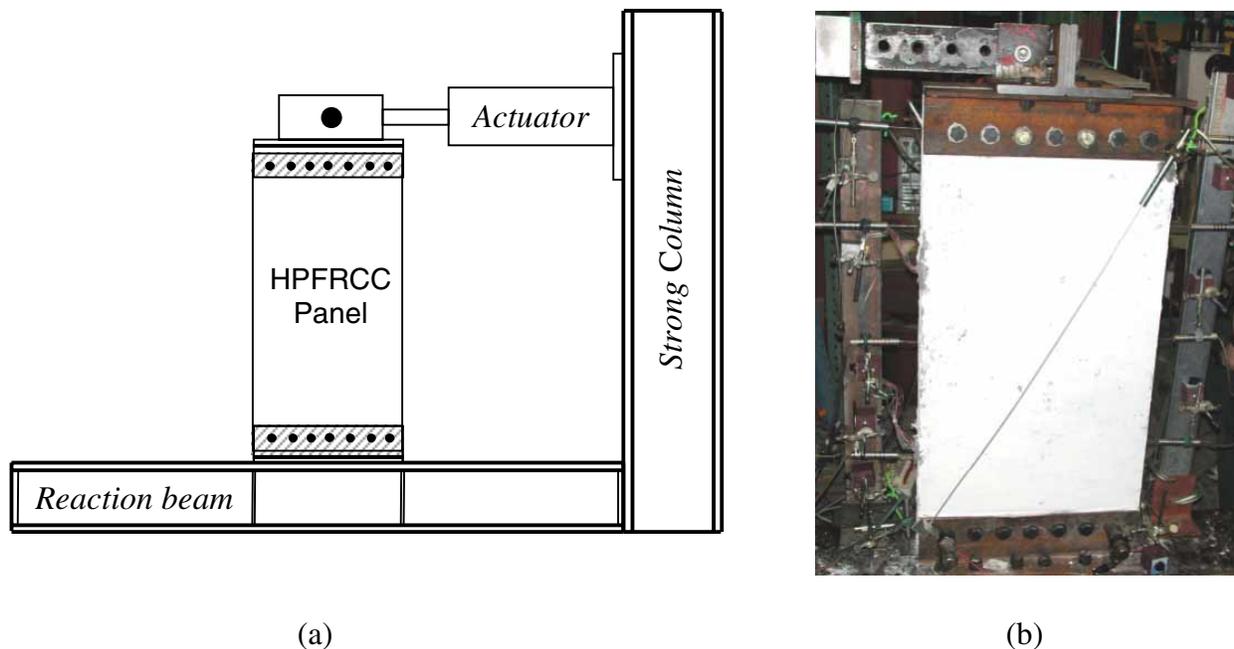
Test set-up for cyclic lateral load experiments on single panels (a), and a panel specimen just prior to testing (b).
